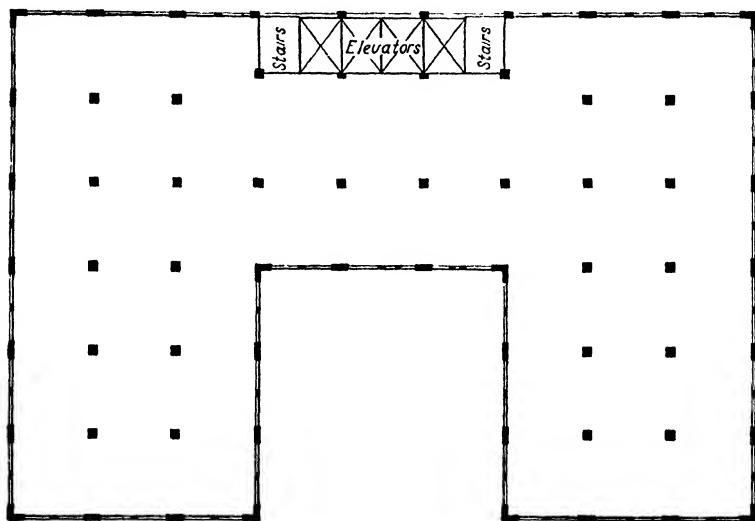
Typical Floor Plan for Office Building. (See p. 804.)
